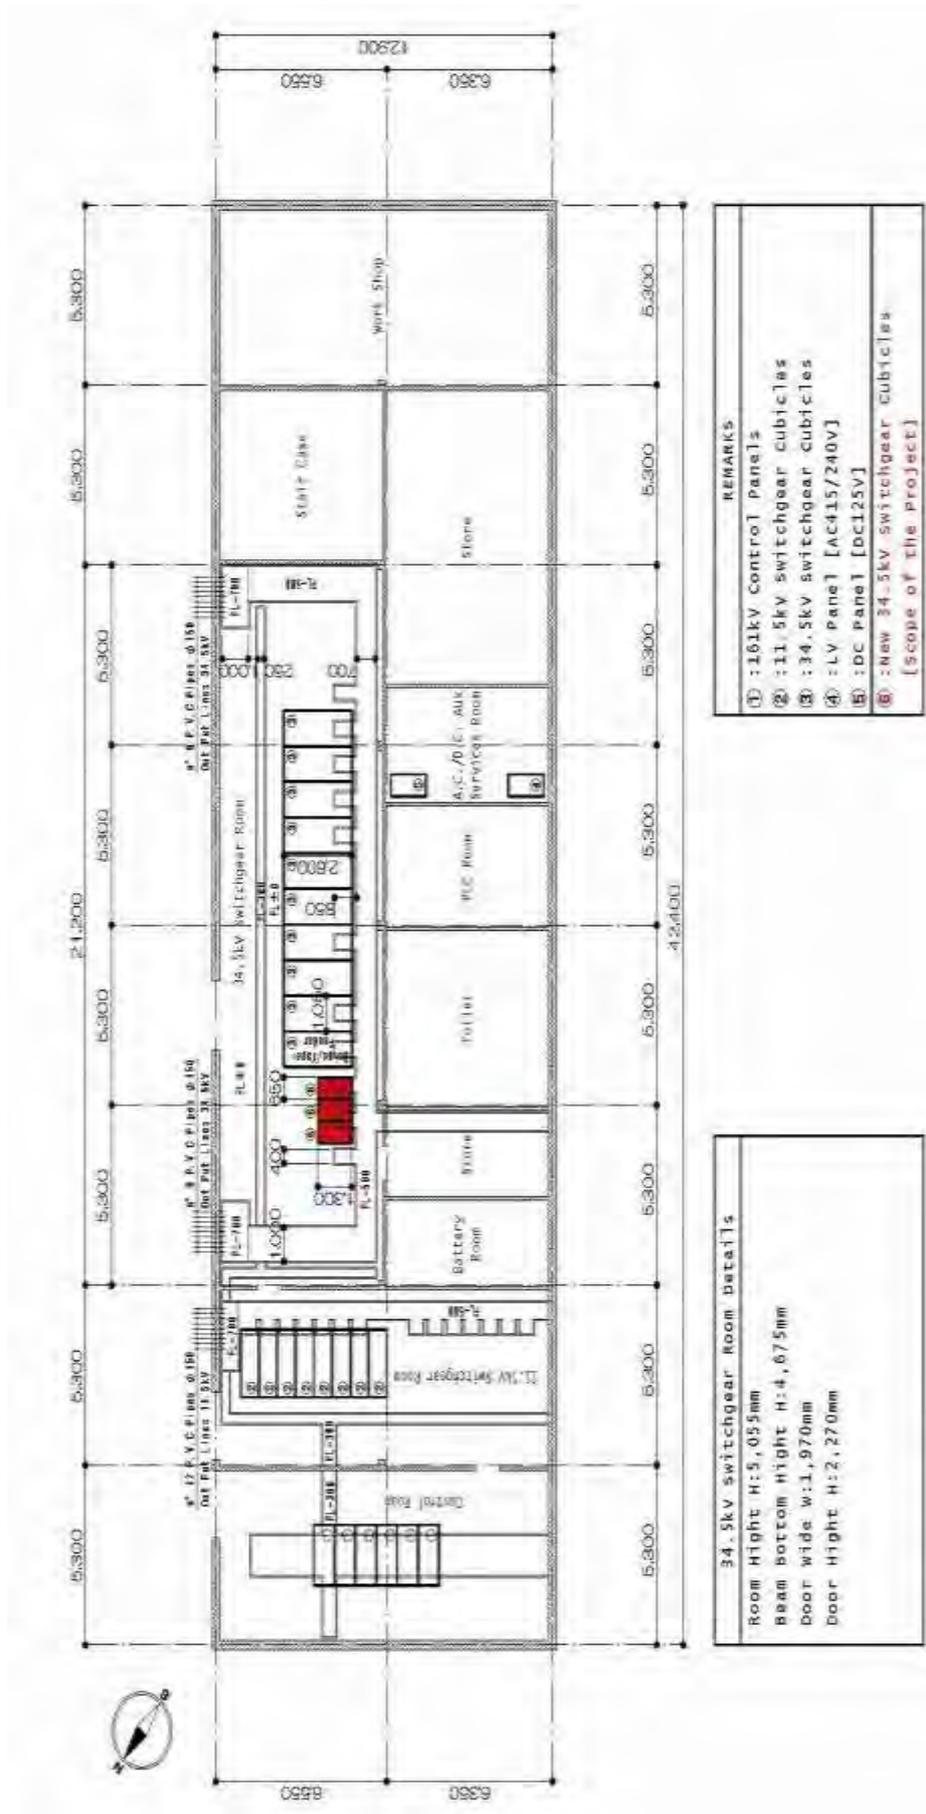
Sectional Plan of UDS Primary Substation
